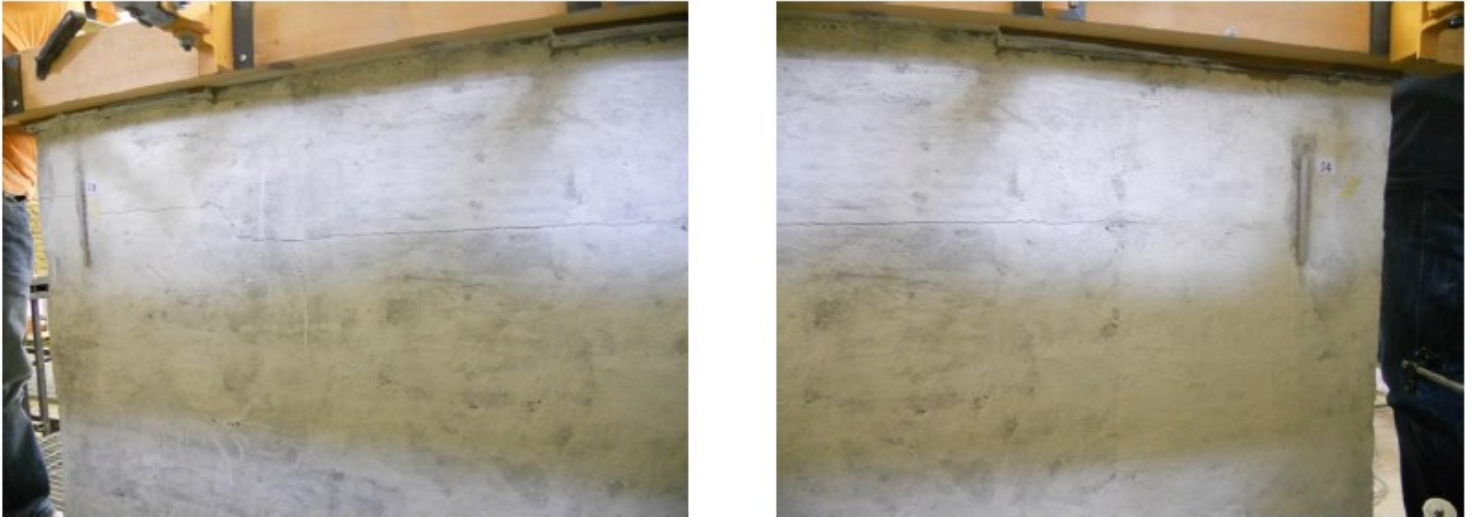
Horizontal crack in the back wall after the first test.
